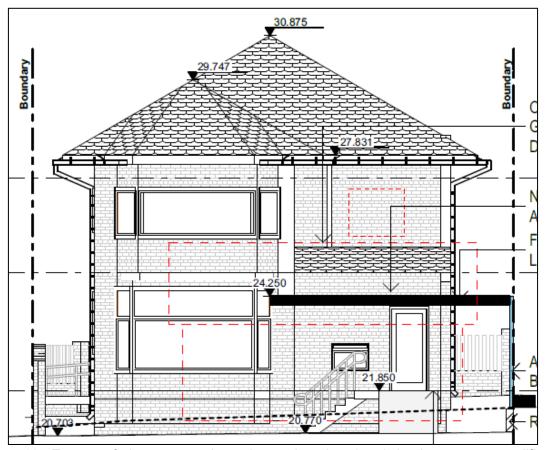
Extract of the proposed southern elevation (rear) in the current modification application.
